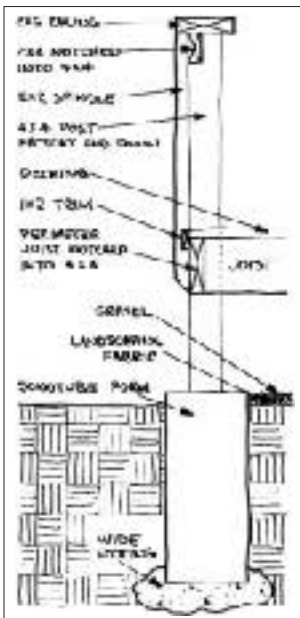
Piers can be formed with Sonotubes; bring the piers up a couple of inches off the ground to help shed water. Make the pier wider at the base.
